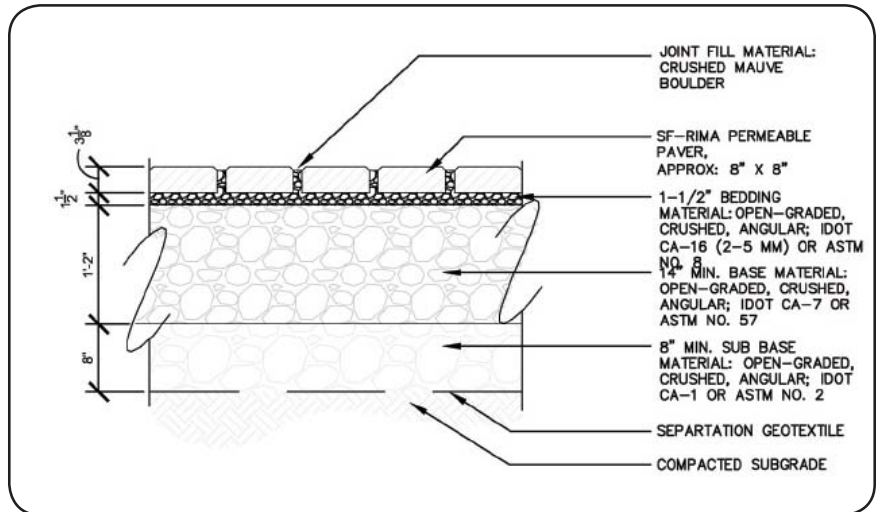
Permeable Paver Construction Detail (JJR)
